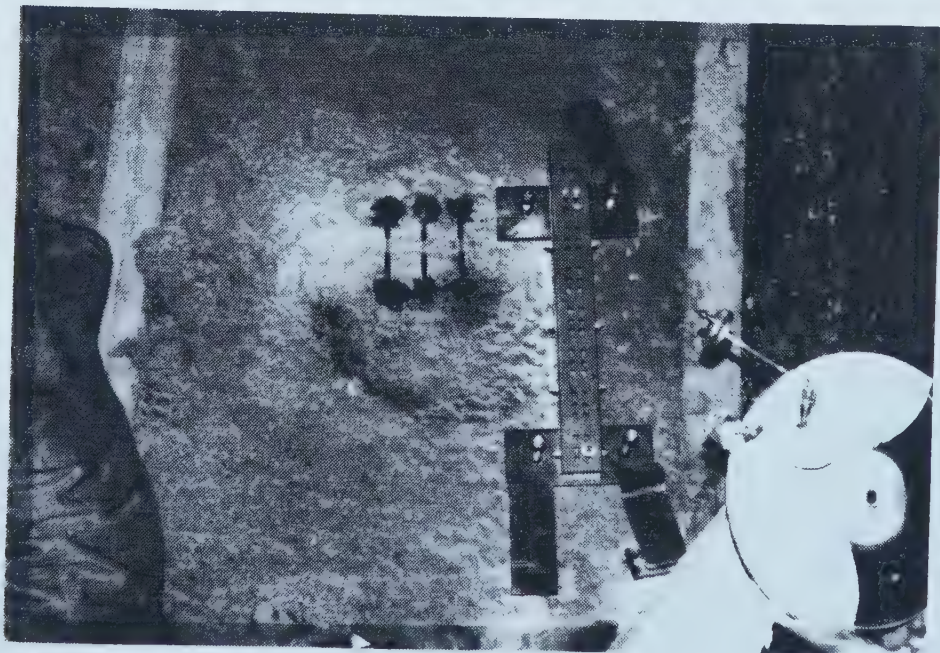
Installation of Vibrating Wire Strain Gages for Mini Flat Jack Test
